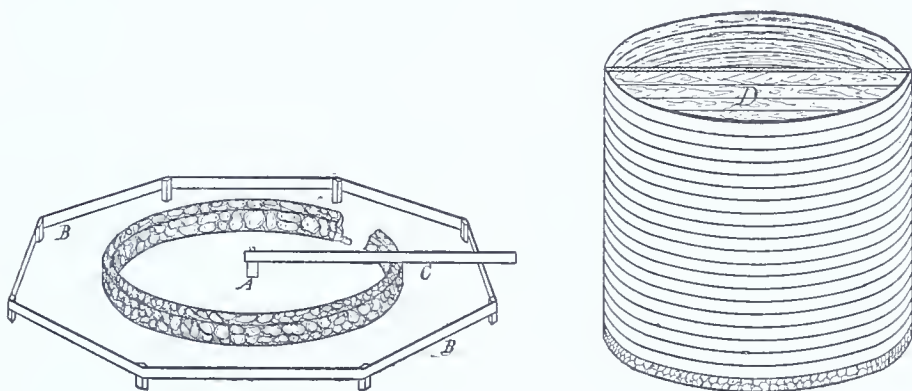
Showing method of laying and leveling foundation of a round silo, and a round silo with a single partition. A, center post with top level with top of proposed wall. B B, straight-edge boards nailed to stakes driven in ground. C, straight edge fixed to turn on a pin at A. B B, are all nailed level with top of post A. D, partition in round silo. It may be placed so as to come in the middle of the single line of doors, letting the same doors answer for both sides.
